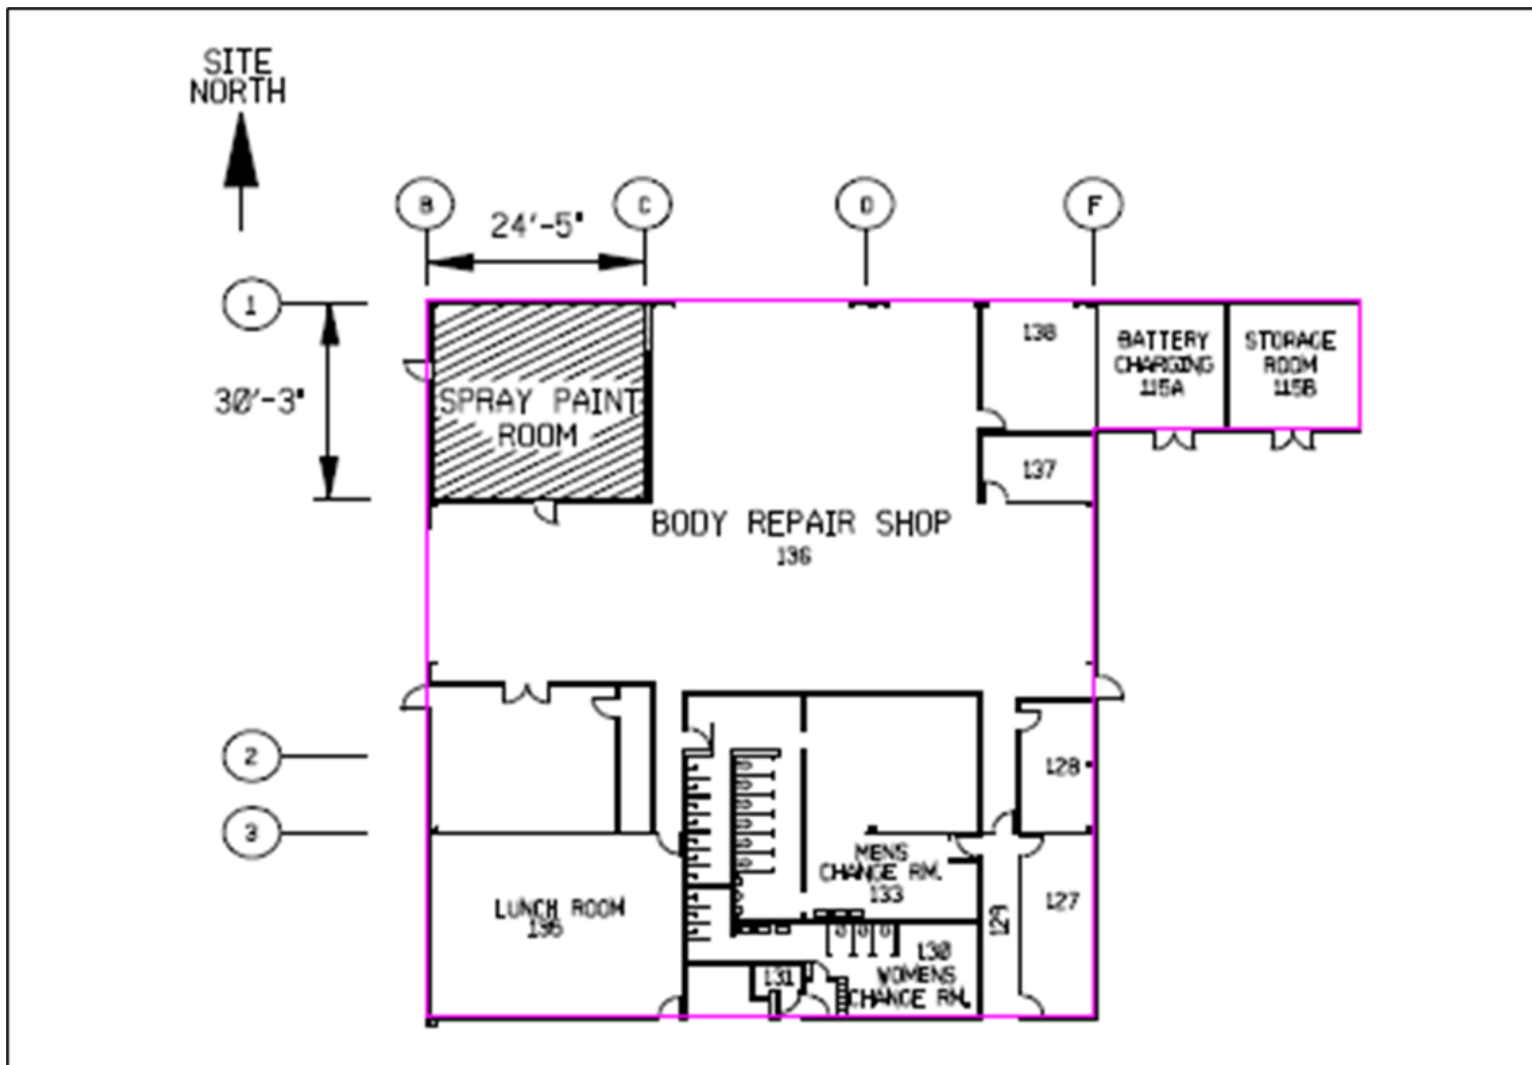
Location of Spray Paint Room in Northwest Corner of Building 716-A
